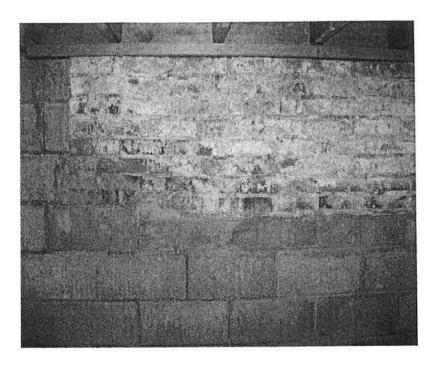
Figure V. Deterioration & efflorescence of existing supported masonry wall.
